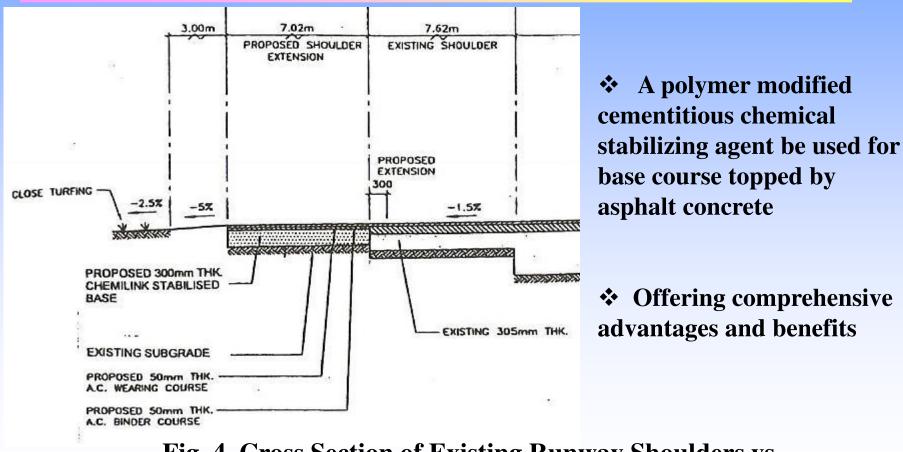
Cross Section of Existing Runway Shoulders vs. Widened Section by Chemical Stabilization
